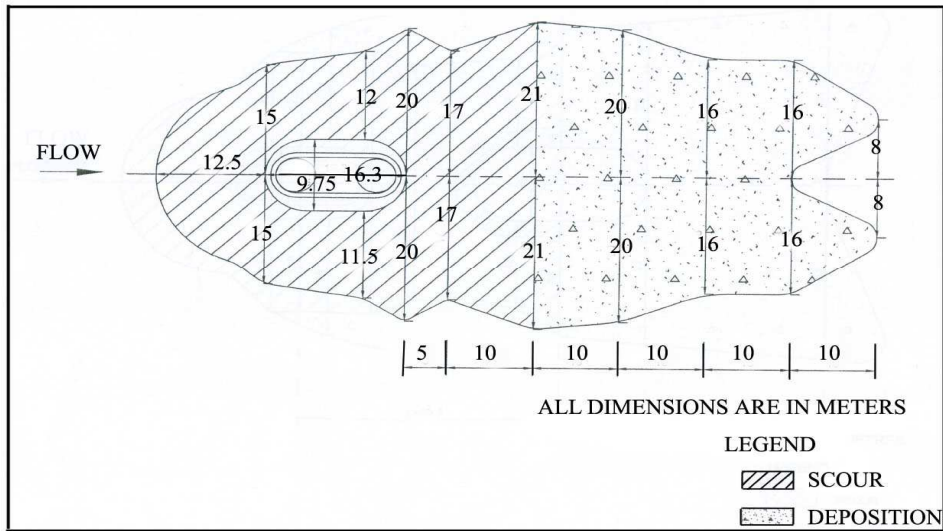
Scour and deposition pattern around a pier of the existing bridge in the absence of the proposed pier
